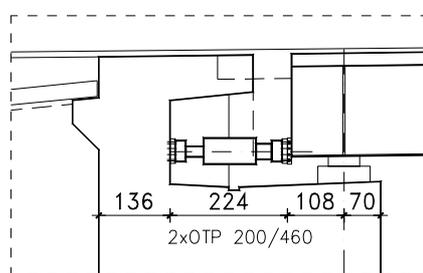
Krka river bridge near Skradin, dampers at abutments.
